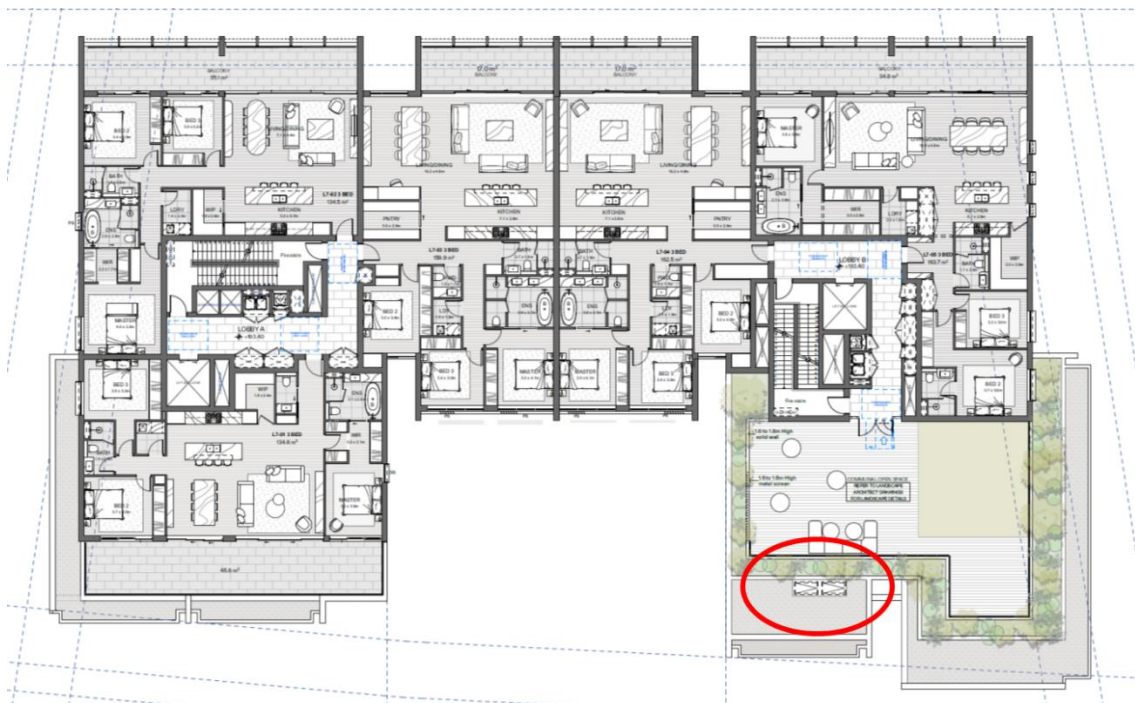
Level 7 floor plan with skylights circled in red (Source: PBD Architects)
